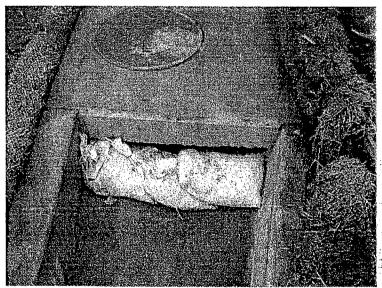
Inlet with gravel bag protection. NOV photo 38.
